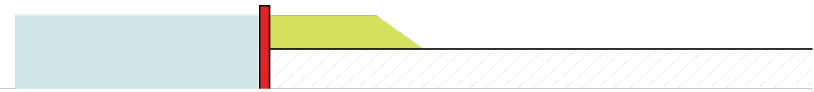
Visual of elevating a seawall and creating new Harborwalk connections along the waterfront.
